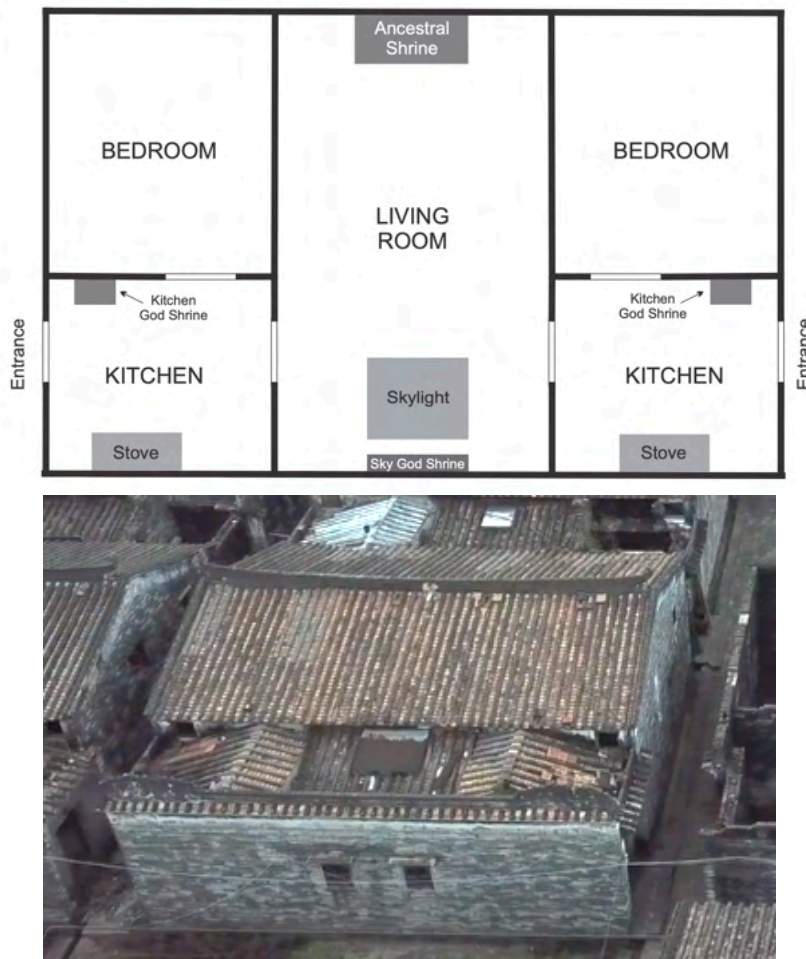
Above, three-bay two-corridor house floor plan (Tan 2013b). Below, the exterior of Wong Ben Jew's three-bay two-corridor house in Wo Hing.
